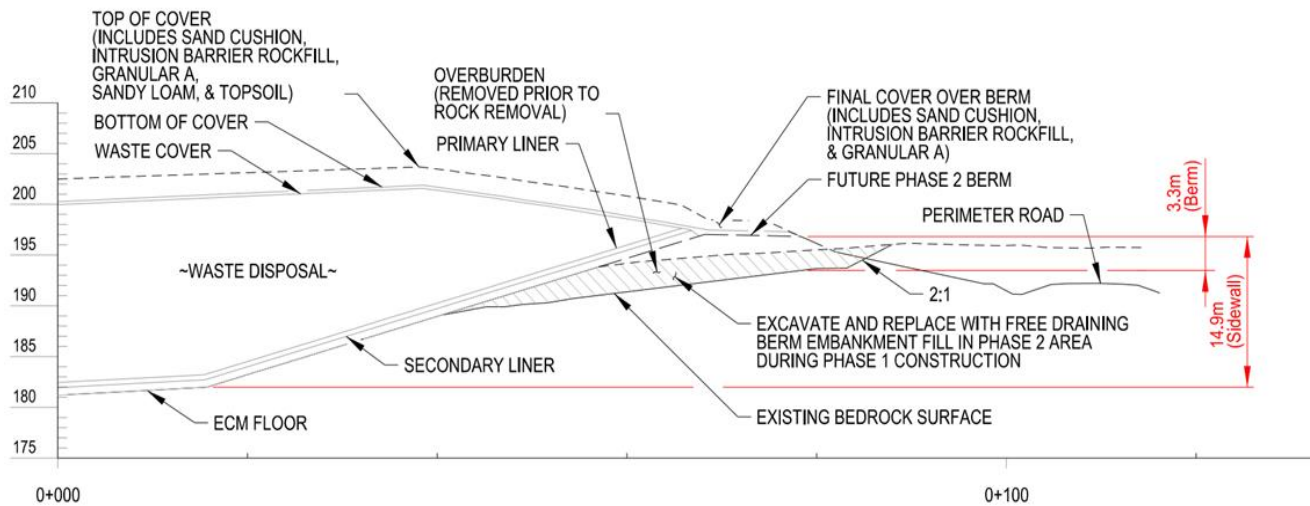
Engineered Containment Mound Perimeter Berm Typical Section
